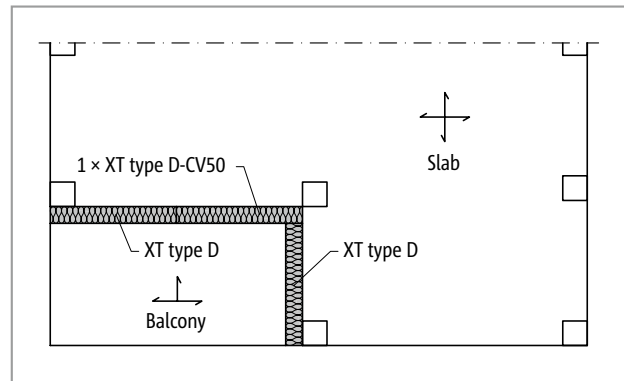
Schöck Isokorb® XT type D: Two-way spanning
